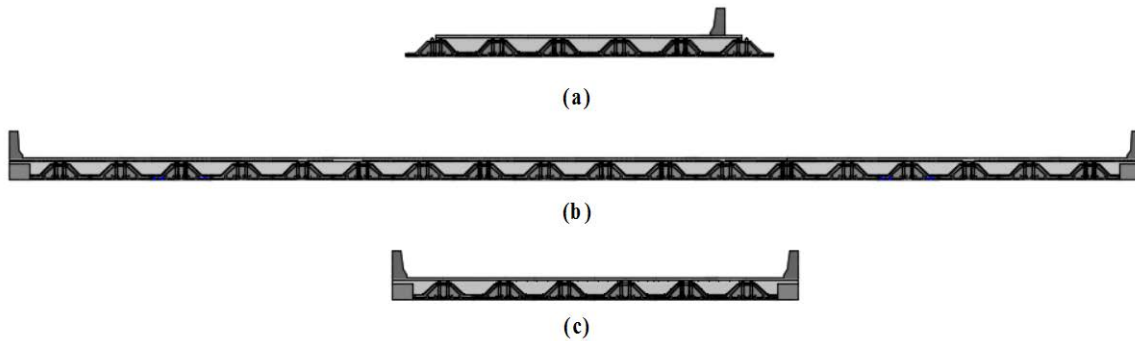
(a) Transverse Cross-Section of Phase I of the U.S. 360 Bridge, (b) Transverse Cross-Section of the Completed U.S. 360 Bridge, (c) Transverse Cross-Section of Towlston Road Bridge
